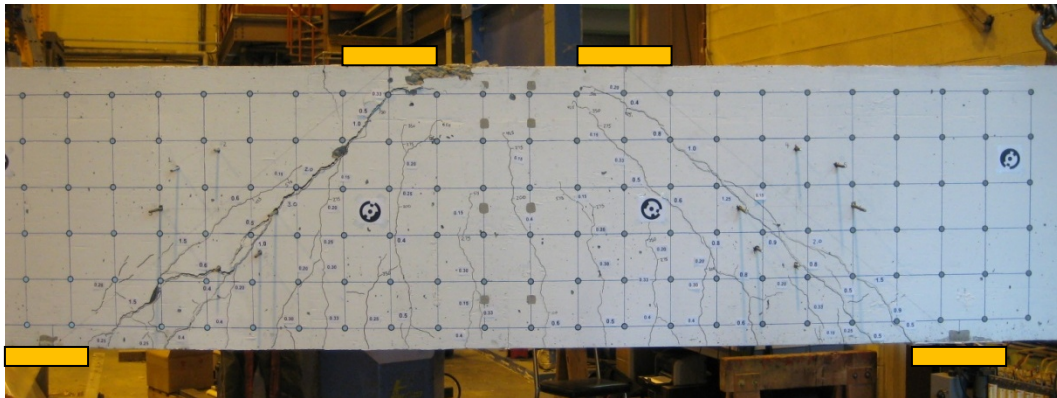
Specimen B2N after testing with failure crack in shear span A (left).
